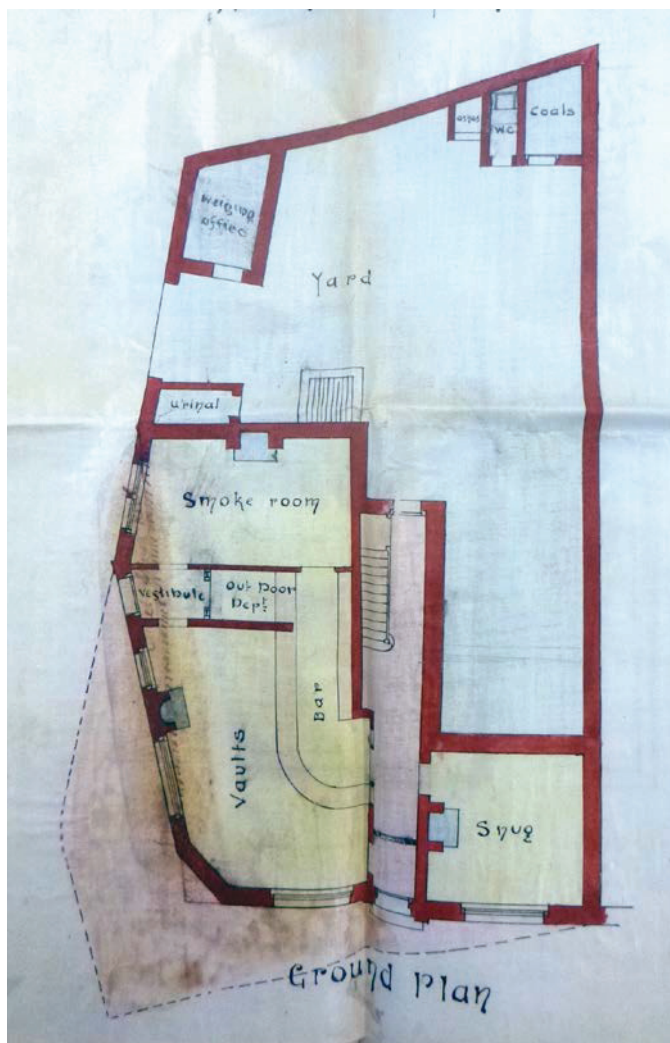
(left): Ground floor plan of proposed alterations, 1893 (north is to the left)
